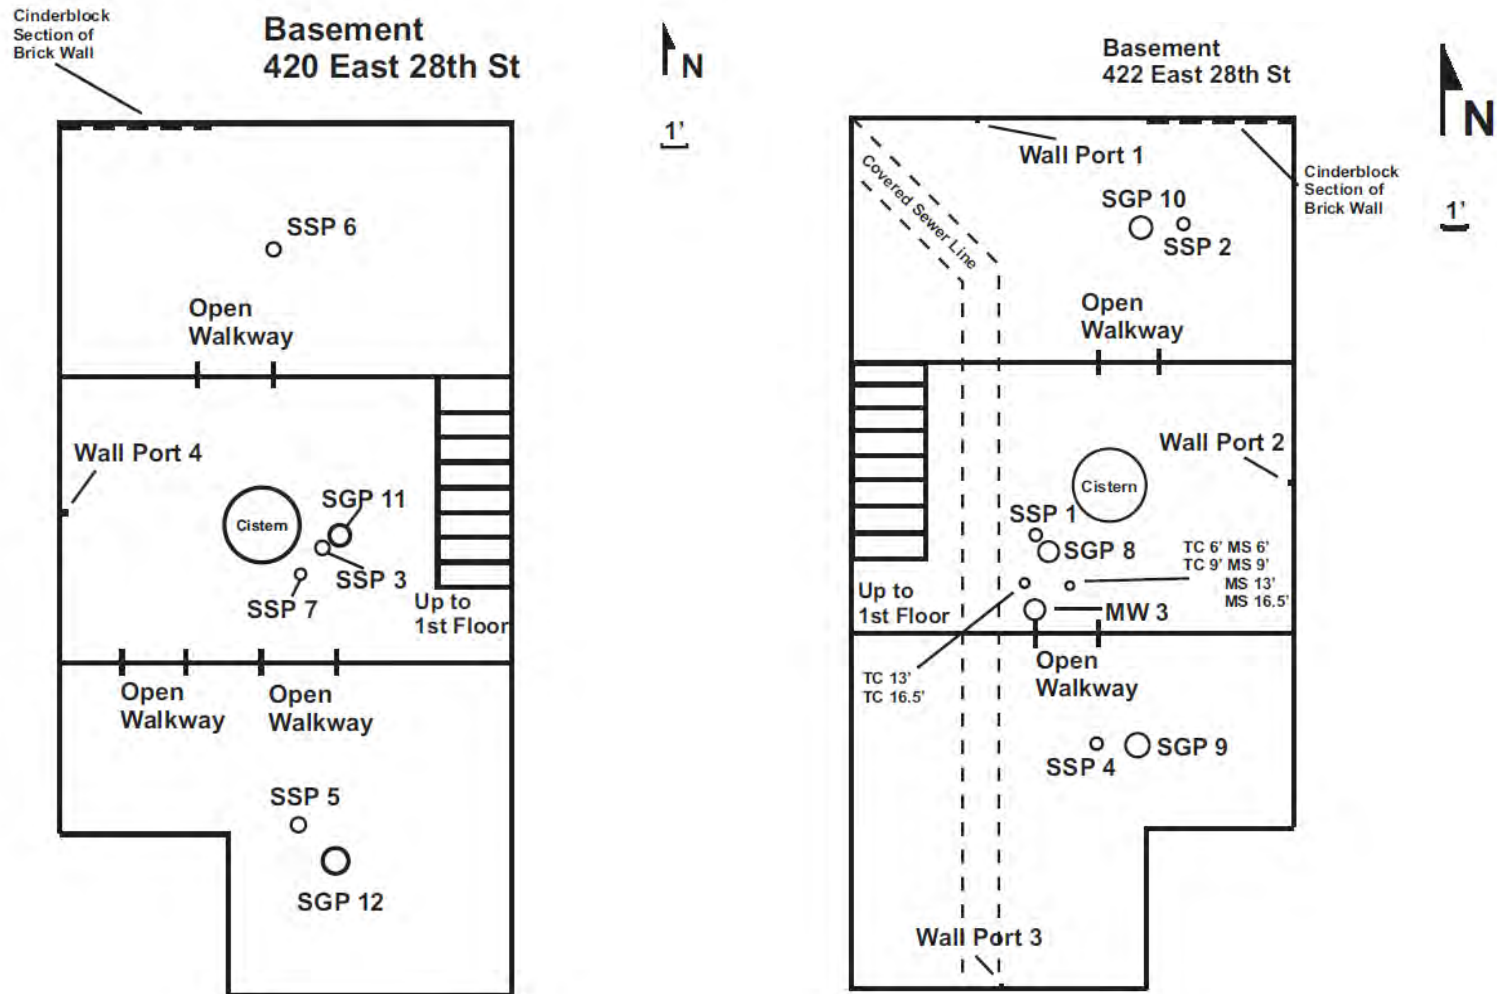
Interior floor plans of 420 and 422 East 28th Street showing sampling locations.
